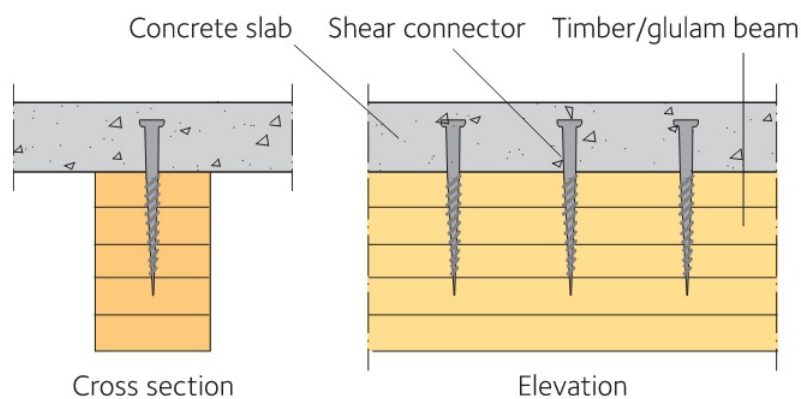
TCC section and elevation. Copyright 2022 by Swedish Wood.
